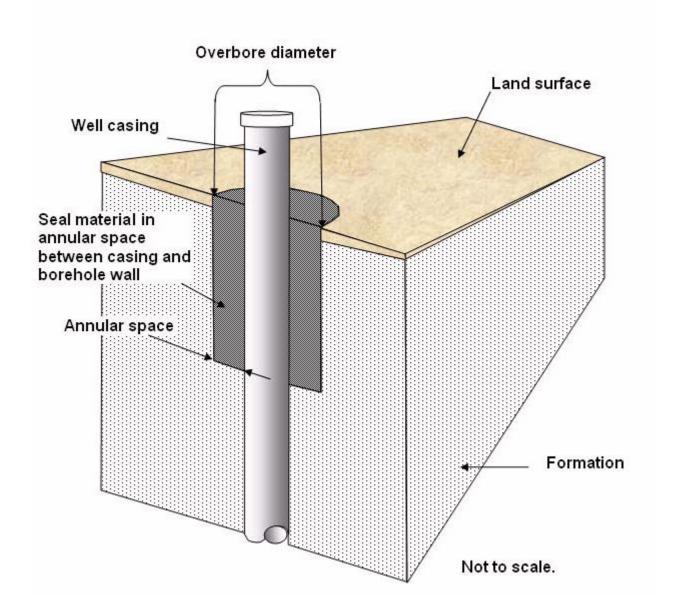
Overbore Requirements When a Tremie Pipe is Left in Place and A Grout Seal Installed.
